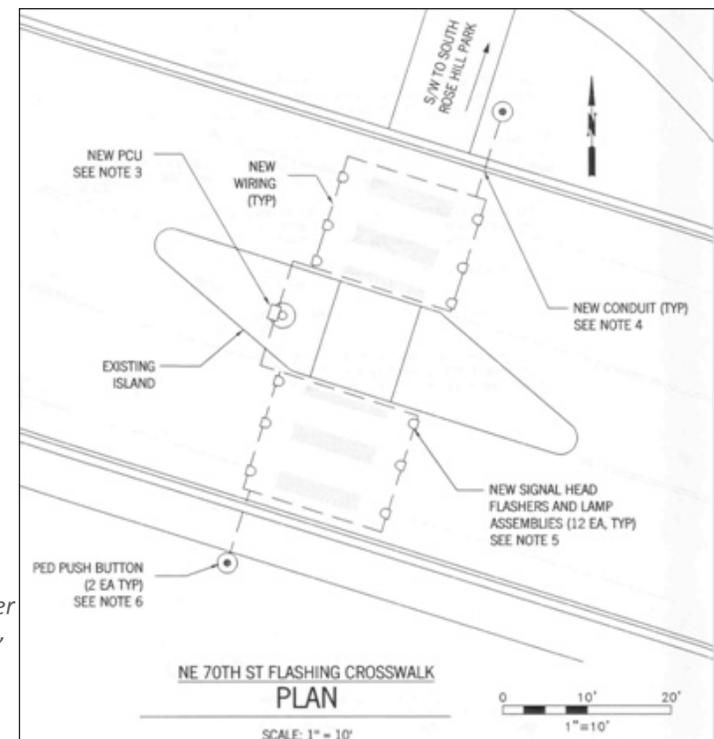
The embedded flasher plan for Kirkland, WA. Image used with permission from the City of Kirkland, WA.
